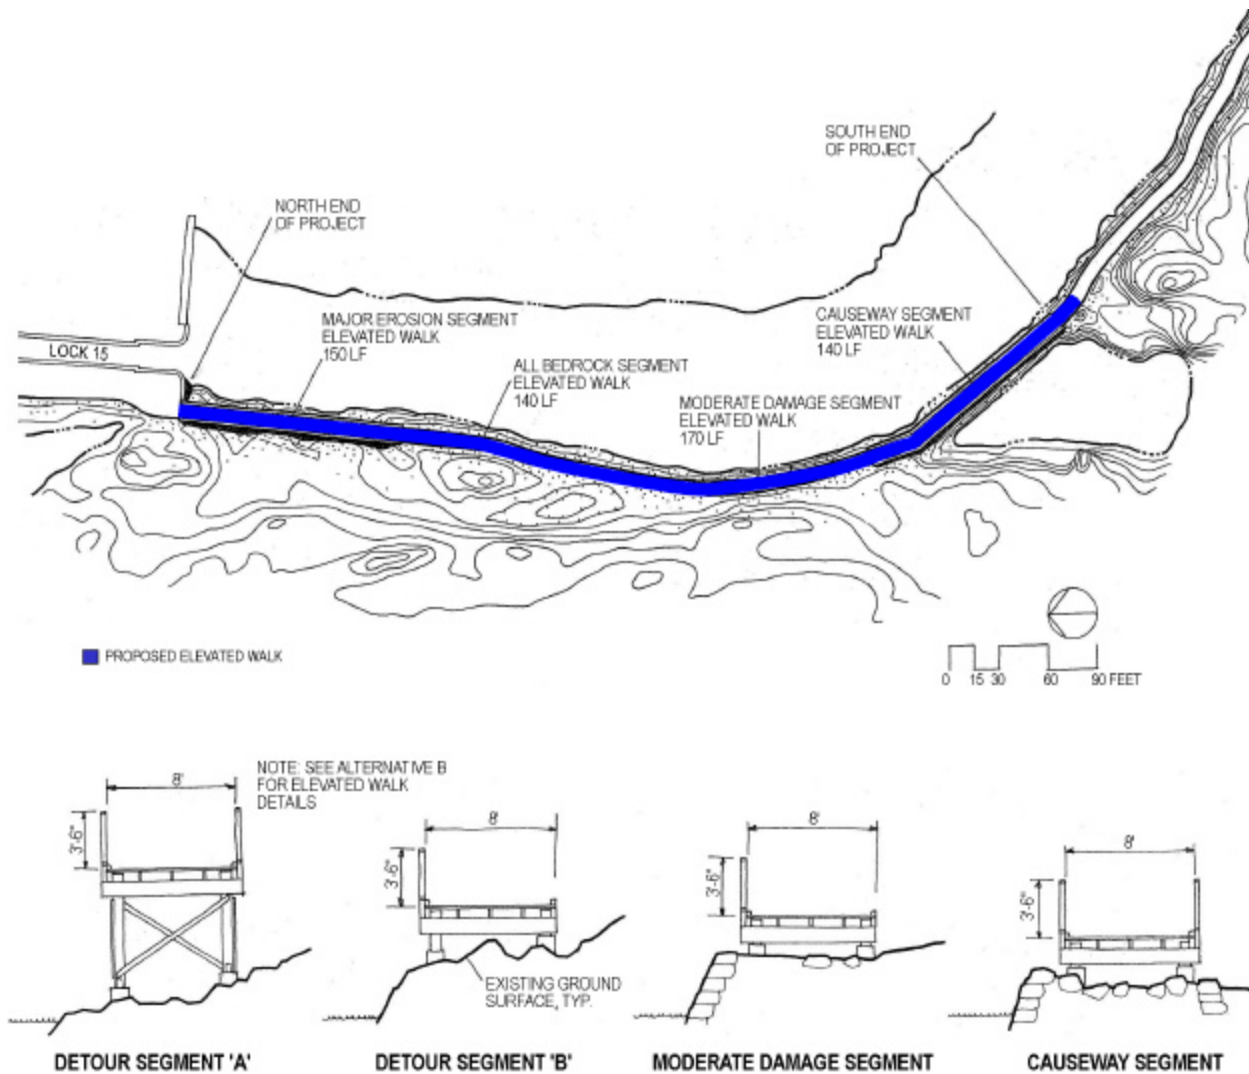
Aerial views and cross-sectional view of Alternative C – All elevated walks.
